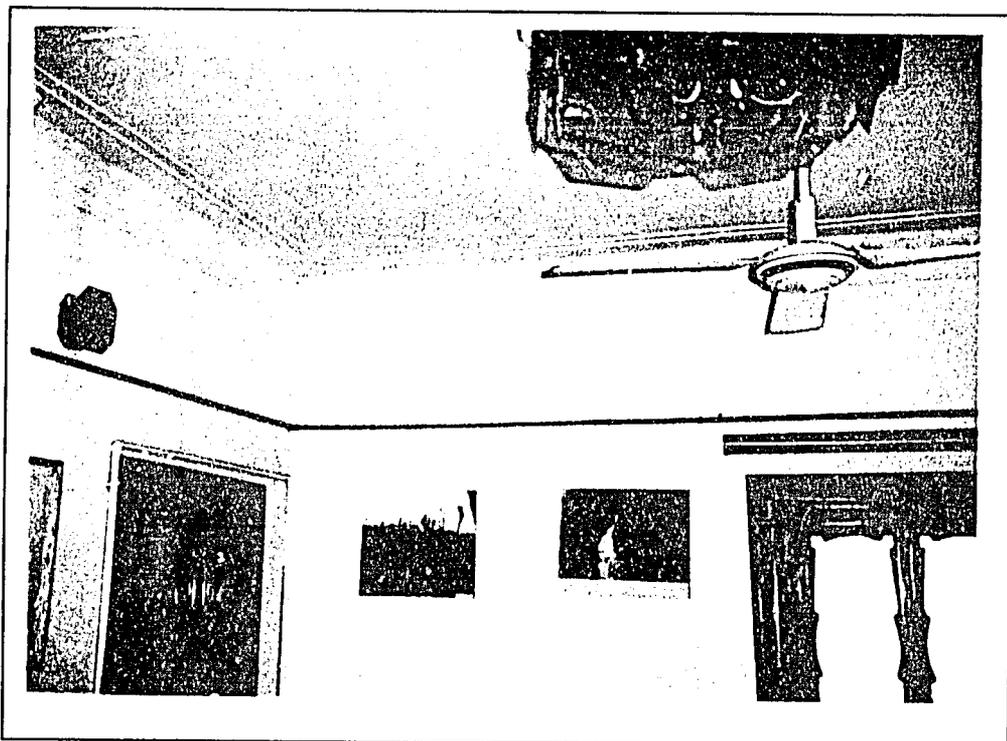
Quetta AID/REP Office Facility. VITA office door on left. Run cable along conduit, in through door frame.
